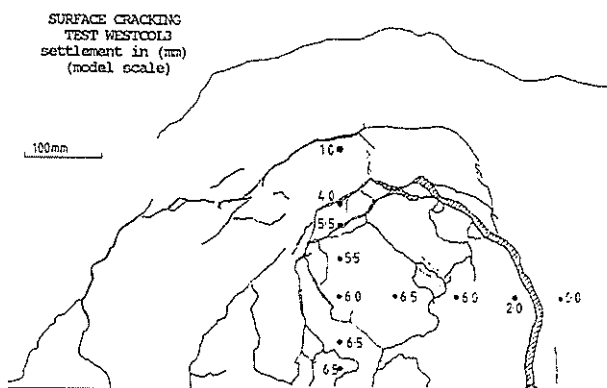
Trace of ground surface crack pattern after test Westcol3.
